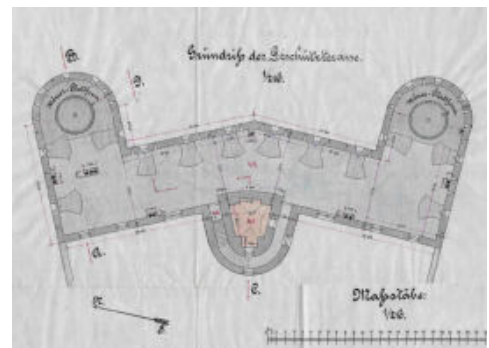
Second floor, cannon terrace, Rapports plan from 1902 (War Archive, Vienna)
